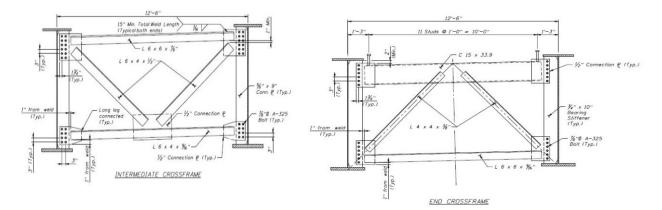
Cross-frame details of the I-95 Bridge over SR-421
